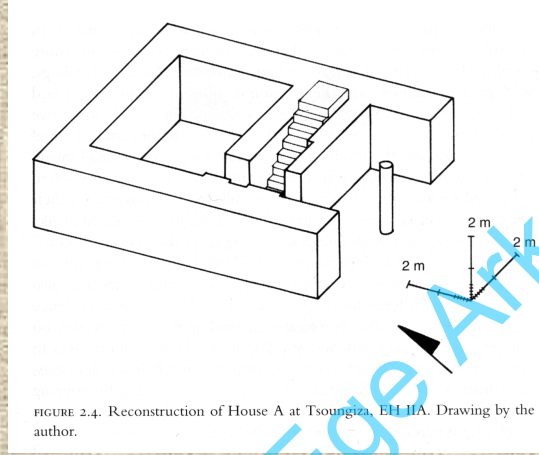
Reconstruction of House A at Tsoungiza, EH IIA. Drawing by the author.
